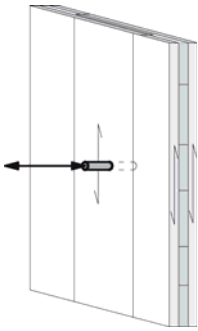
Fasteners in the surface (also lateral face) subject to withdrawal
